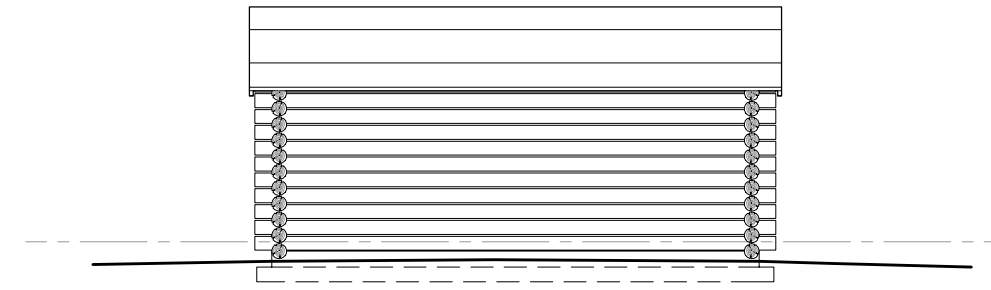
through 157 show the existing conditions of HS-411, New Cabin.
